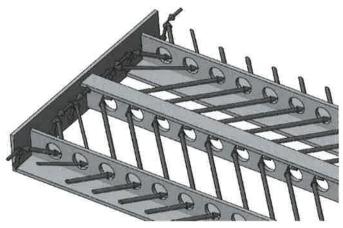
Load-carrying mechanism of concrete strut model with 500 mm spacing between shear connectors (shear coupling mechanism only); axonometric view. Institute of Structural Engineering, TU Wien [2]
